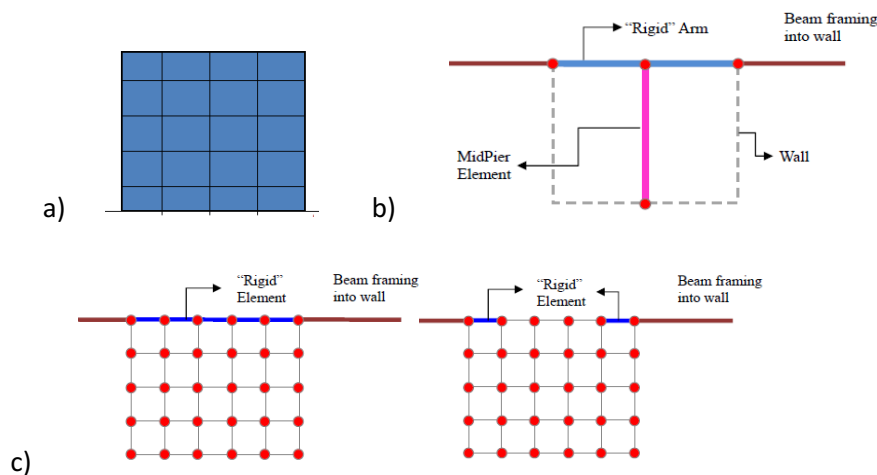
Examples of three different ways to model a single structural wall with frame elements in engineering analysing software's; a) modelling with shell elements, b) modelling with frame elements, c) modelling with rigid beams in the upper strip of the structural wall (source: Kubin, J., et al., 2008)
